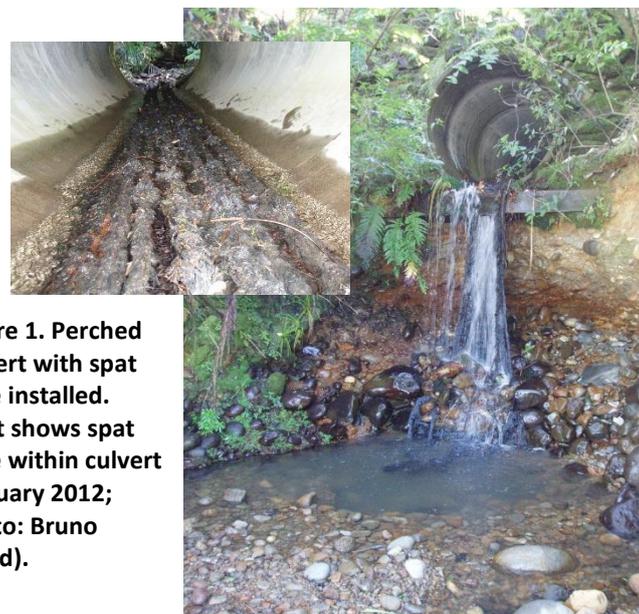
Perched culvert with spat rope installed. Inset shows spat rope within culvert (January 2012; Photo: Bruno David).
